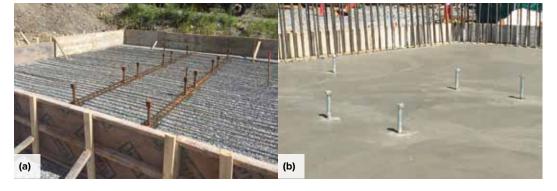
Concrete modules were anchored to the base slab of the test tank using welded embedments: (a) embedments were placed on the prepared base prior to placement of the bottom mat of reinforcing; and (b) bolts were installed in the couplings prior to concrete placement
